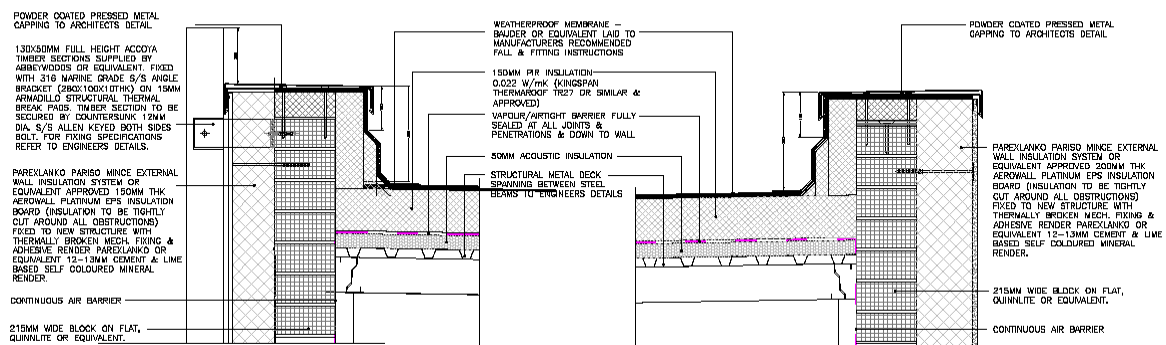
Parapet details (not to scale) [DLR Co. Co., 2014]
